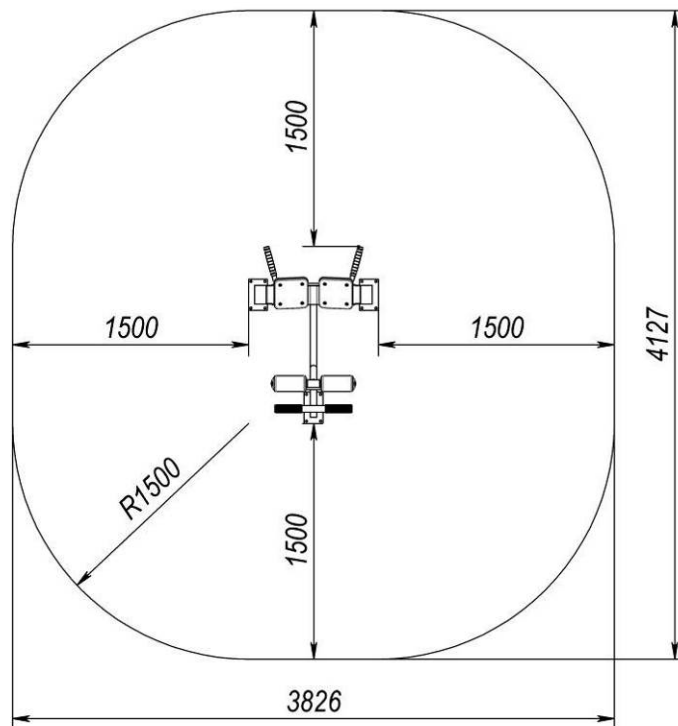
Assembly scheme (Identical assembly scheme for KF816.1-2, KF816.1-3, KF816.2-12)
